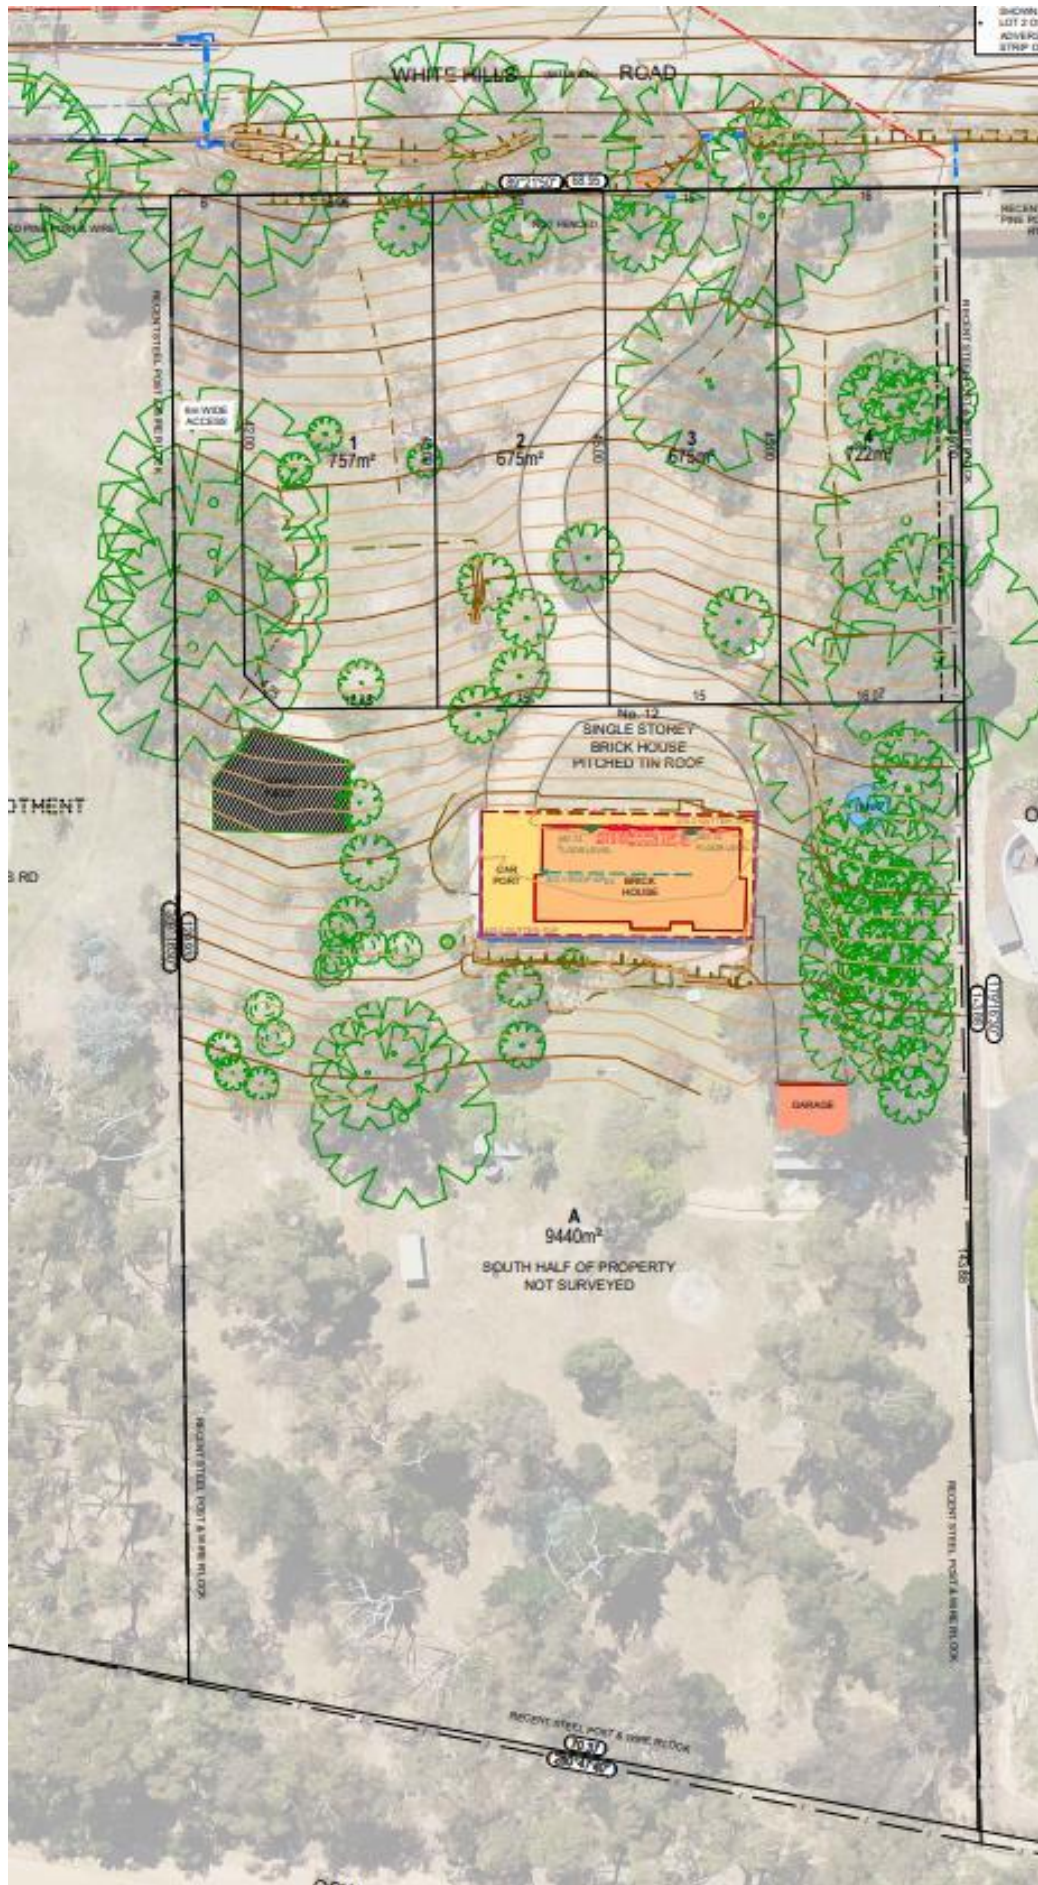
PROPOSED 5 LOT SUBDIVISION
